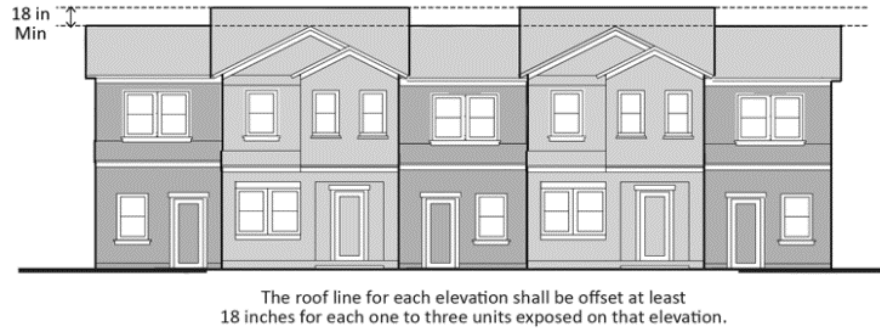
C.10.180-3: BUILDING FAÇADE ELEMENTS
